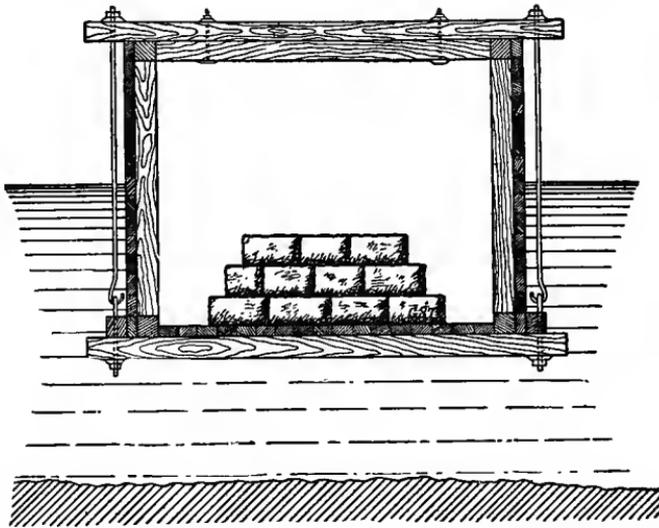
DIAGRAMMATIC REPRESENTATION OF OPEN-CAISSON AND PIER.
